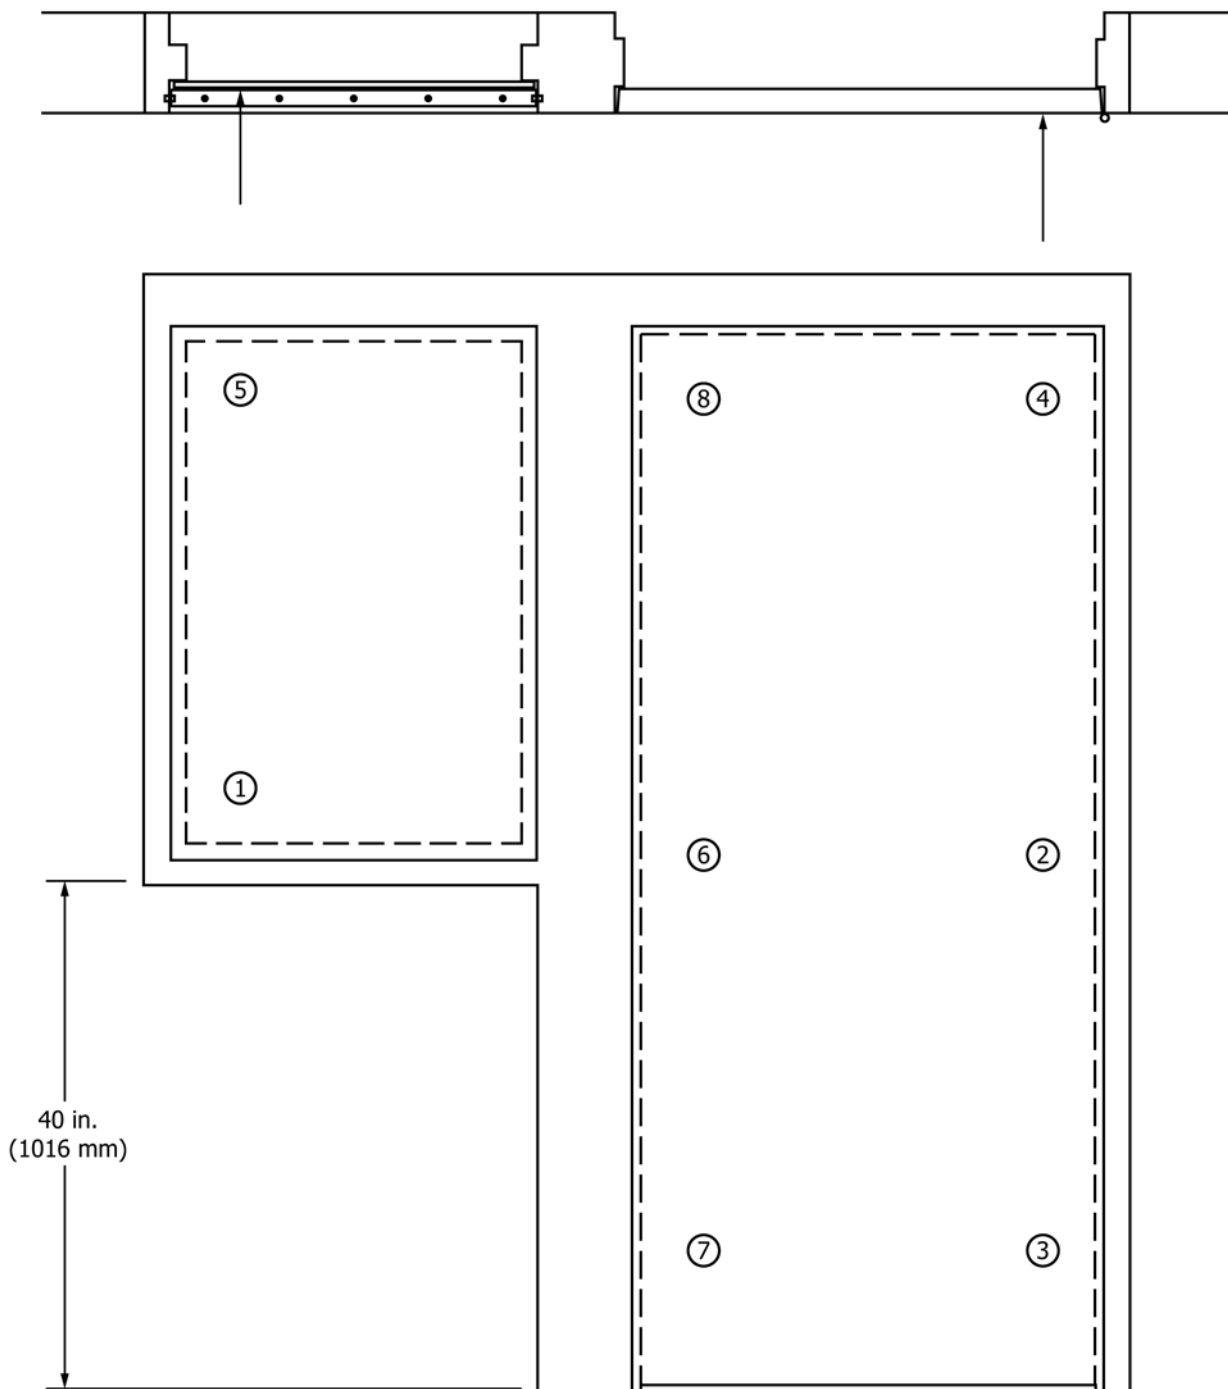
Detention Hollow Metal Test Assembly (Sidelight Frame) Location of Strike Points Described in Table 1
